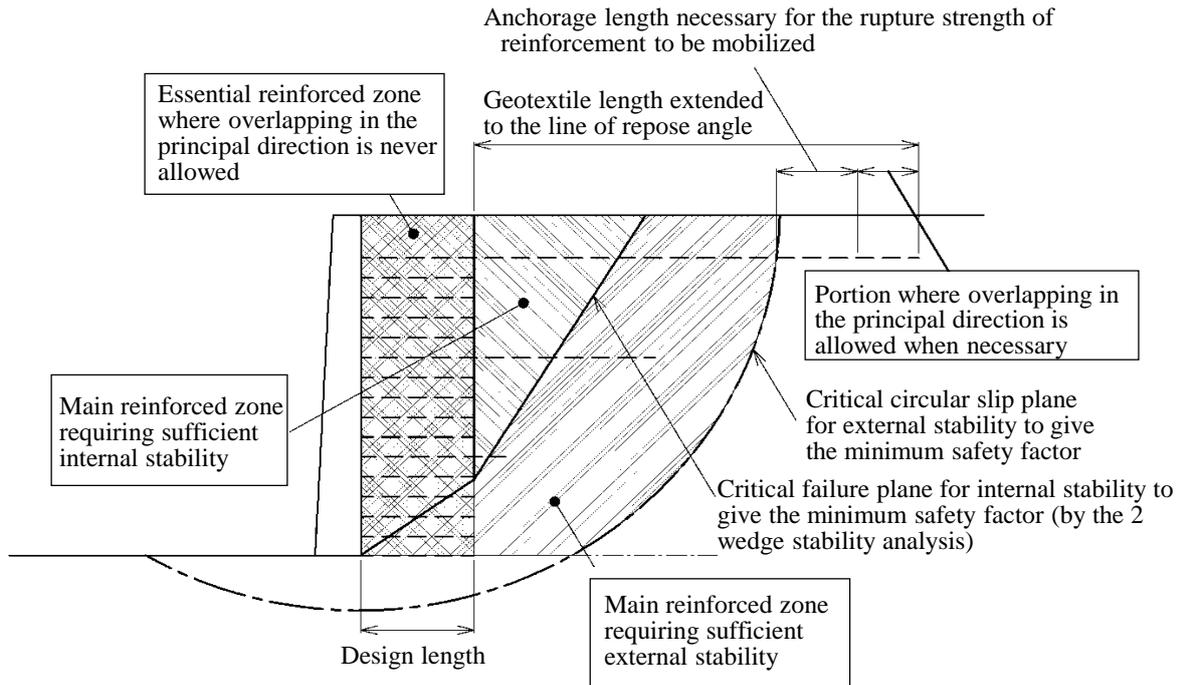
Explanation schematic view about connection of geotextile sheets
